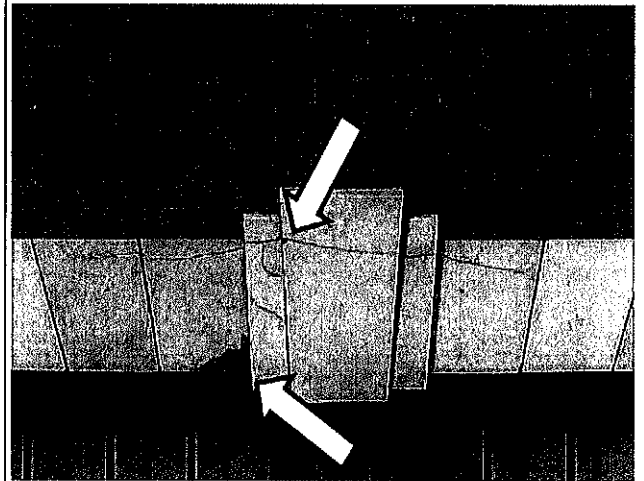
Cracked and spalled stone elements above a third-floor window head
